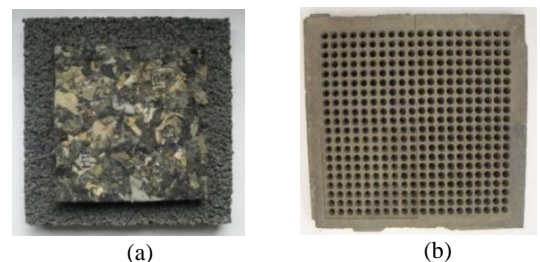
A pervious concrete panel M38_1 (a), and a perforated concrete panel B06 from its reverse side (b).
